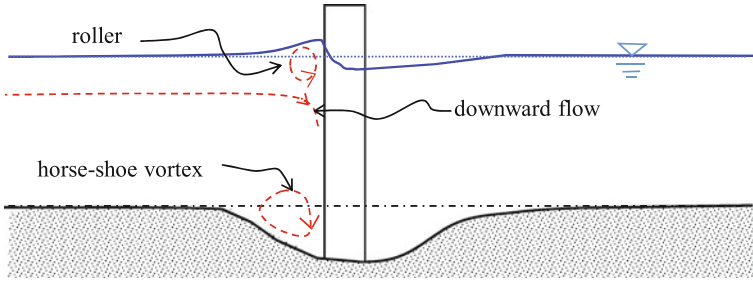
Layout of a longitudinal scour profile localized near a bridge pier
